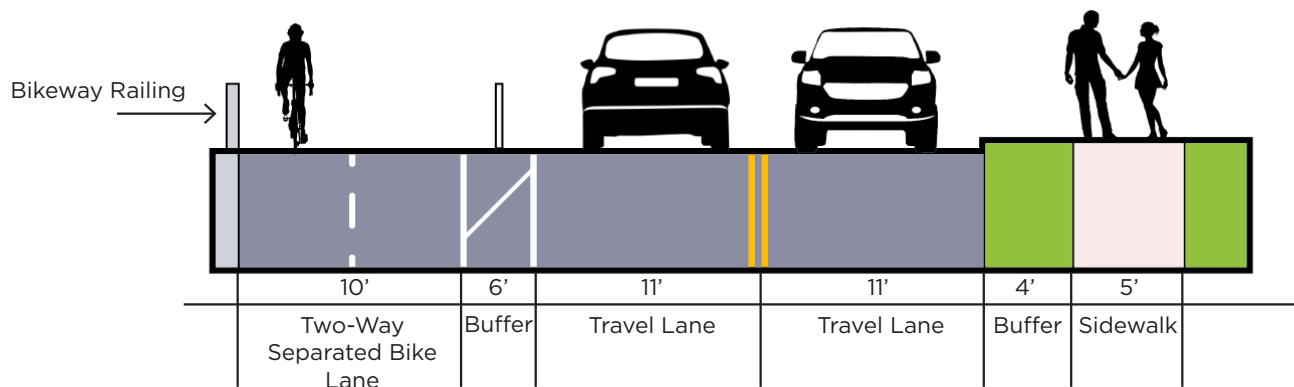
Riverside Drive Proposed Section - Short-term (looking northbound)
